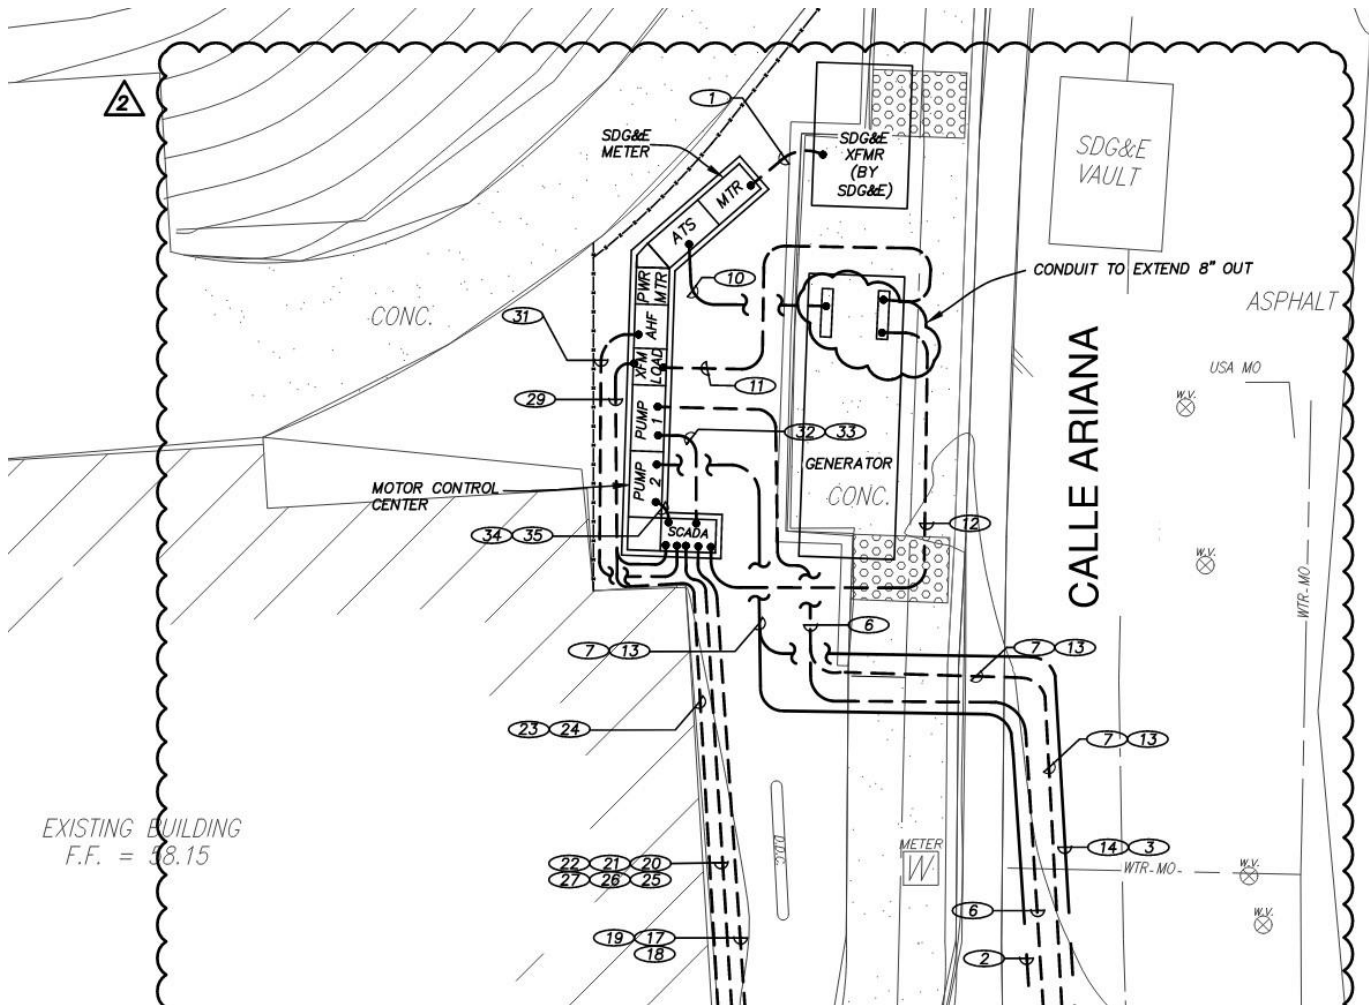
Single Sewer Lift Station Relocation Electrical Site Plan
